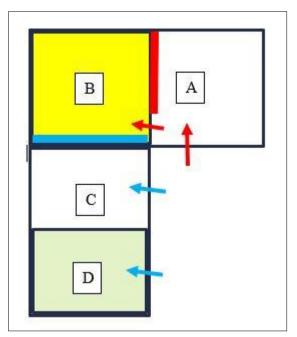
Drawing of Surveyor access points into Transition Room (Red arrows) and Substation Room (Blue arrows).
